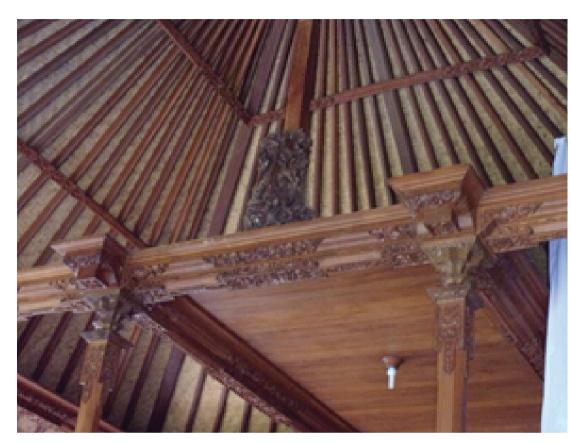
Roof construction of bale – Jro Kuta, Denpasar.
